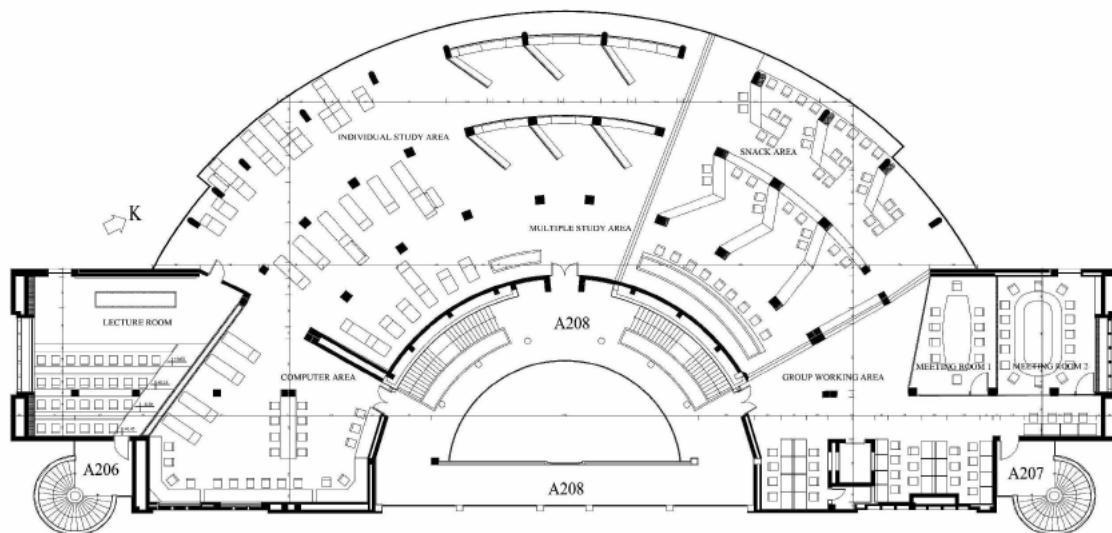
The technical drawing (plan) of project site with its interior design elements.
